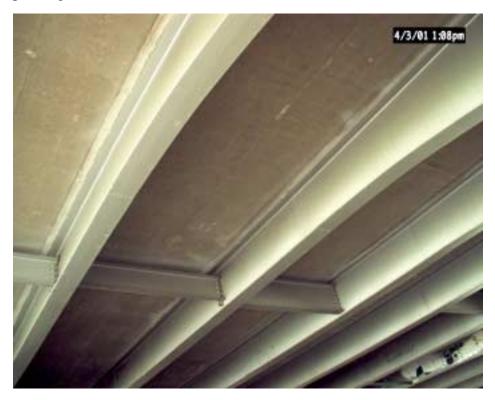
Girders on bridge at Jacobs-Broadway-Gray, between 1st and Brook before painting.
